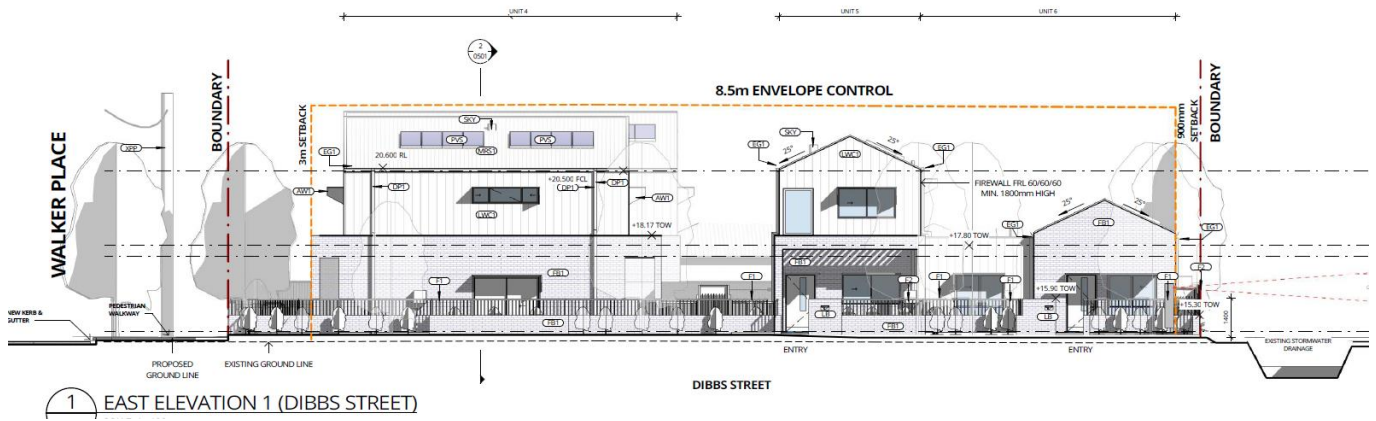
Extract from Architectural Plans – Dibbs Street eastern elevation (Source: Appendix A Architectural Plans prepared by Webber dated 20/11/2023)
